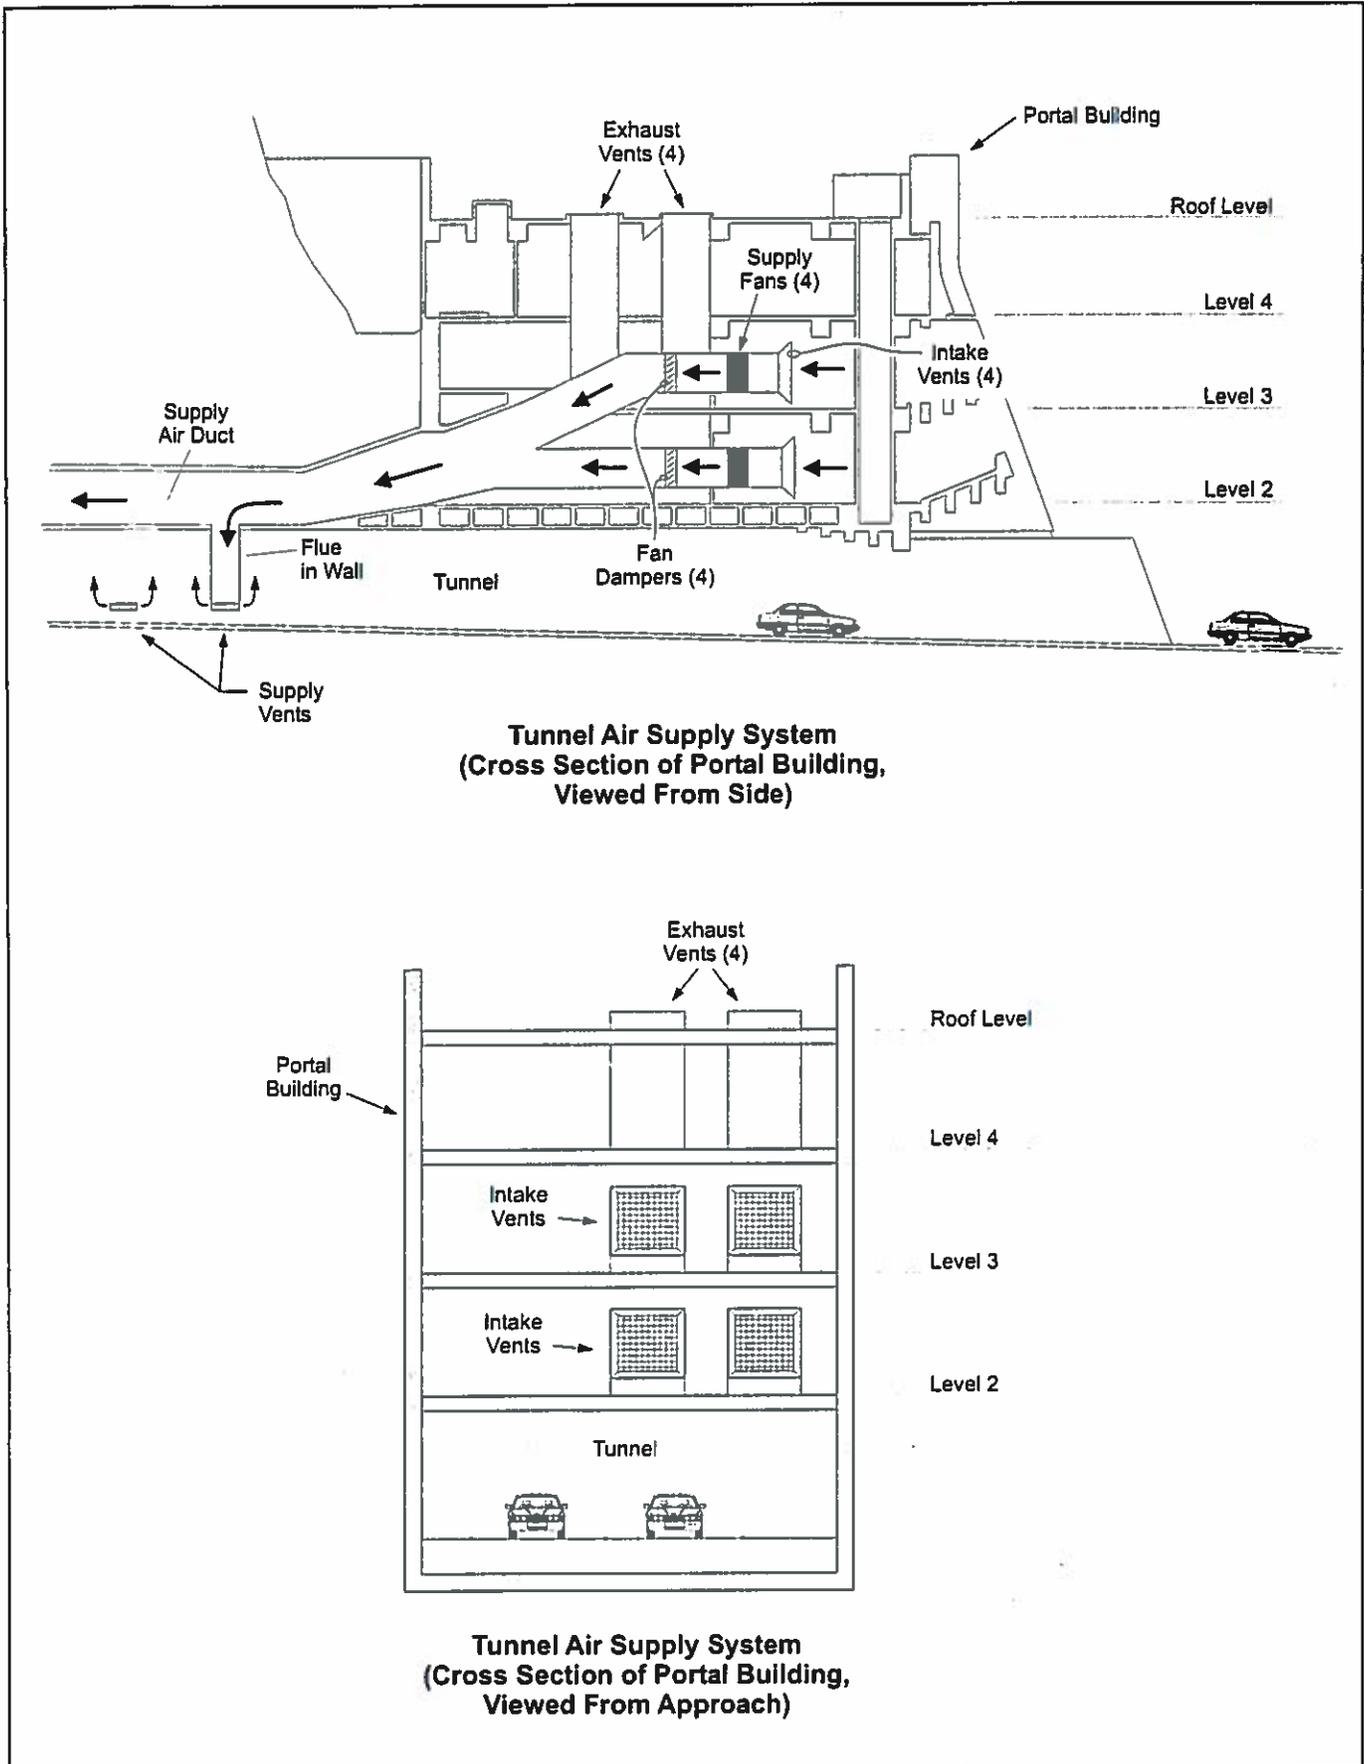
The tunnel supply ventilation fan system is located on Level 2 and Level 3 of each portal building. The exhaust air is discharged at the roof level.
